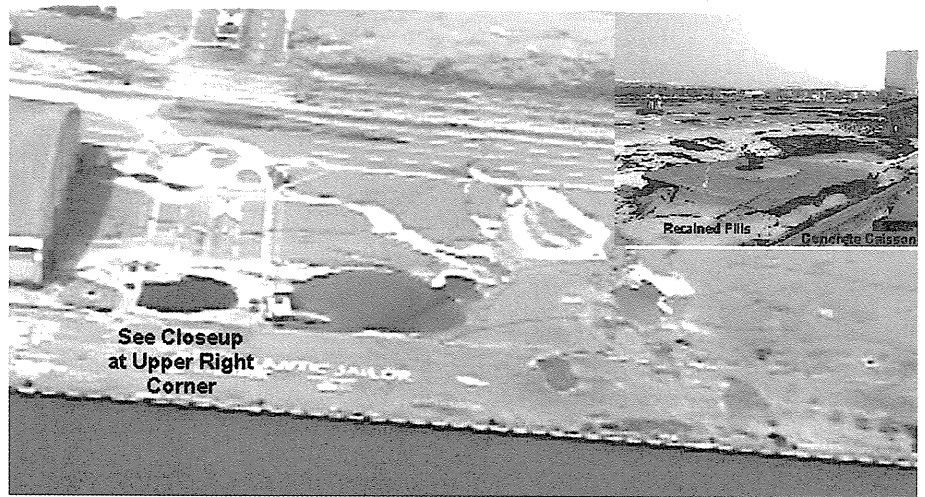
Settlement behind laterally displaced caisson sections at Berth 1, Port of Taichung. (Photo: J.D. Bray)
